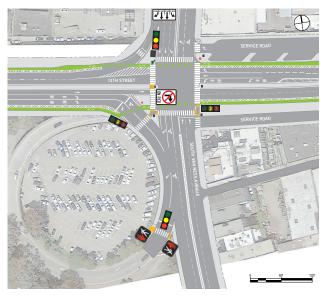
South Van Ness Avenue and 13th Street Improvement Plan
